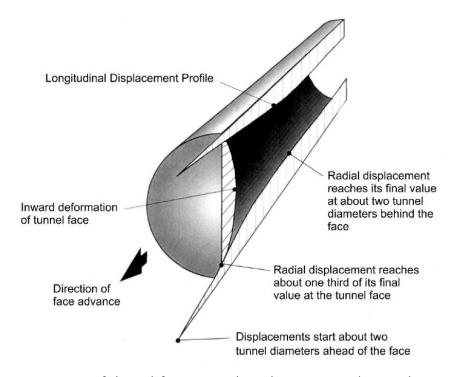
pattern of elastic deformation in the rock mass surrounding an advancing tunnel
